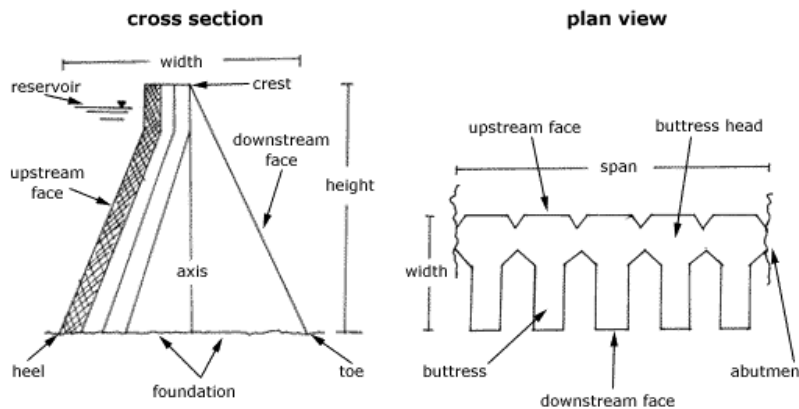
Concrete Buttress Dam Cross-Section and Plan View. (SimScience, 2013)
